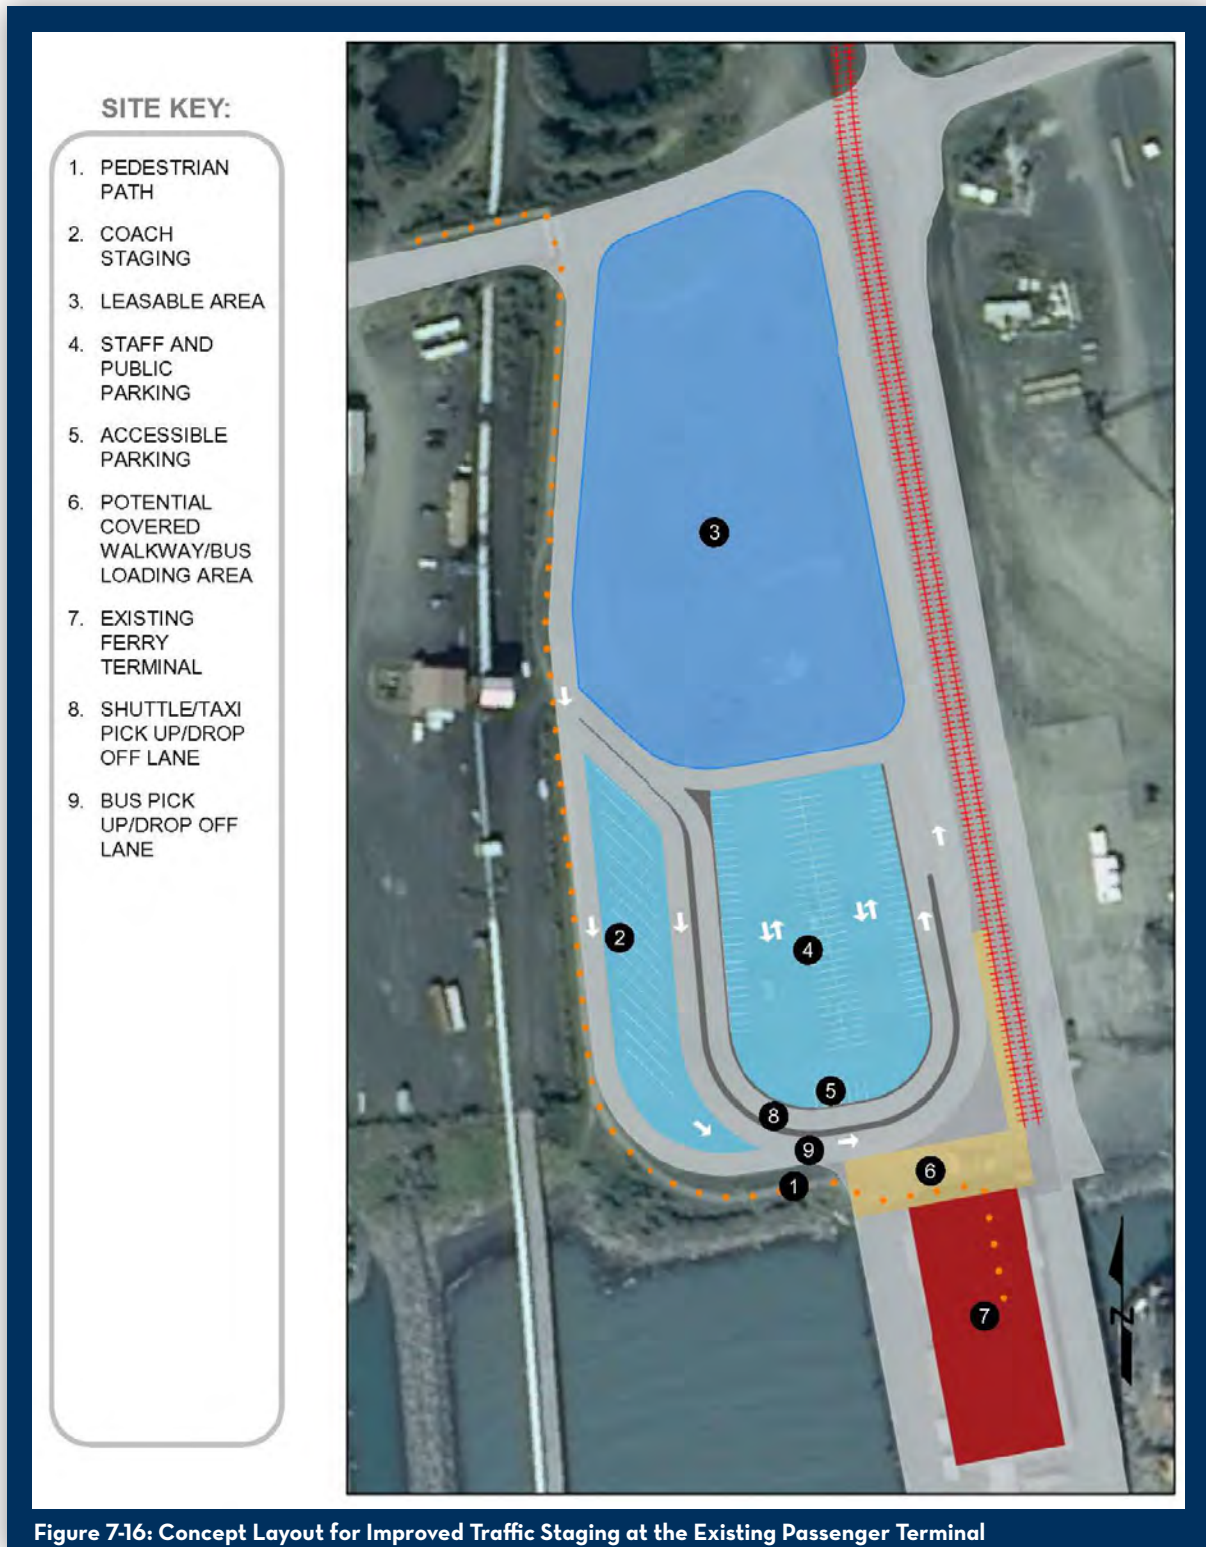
Concept Layout for Improved Traffic Staging at the Existing Passenger Terminal
